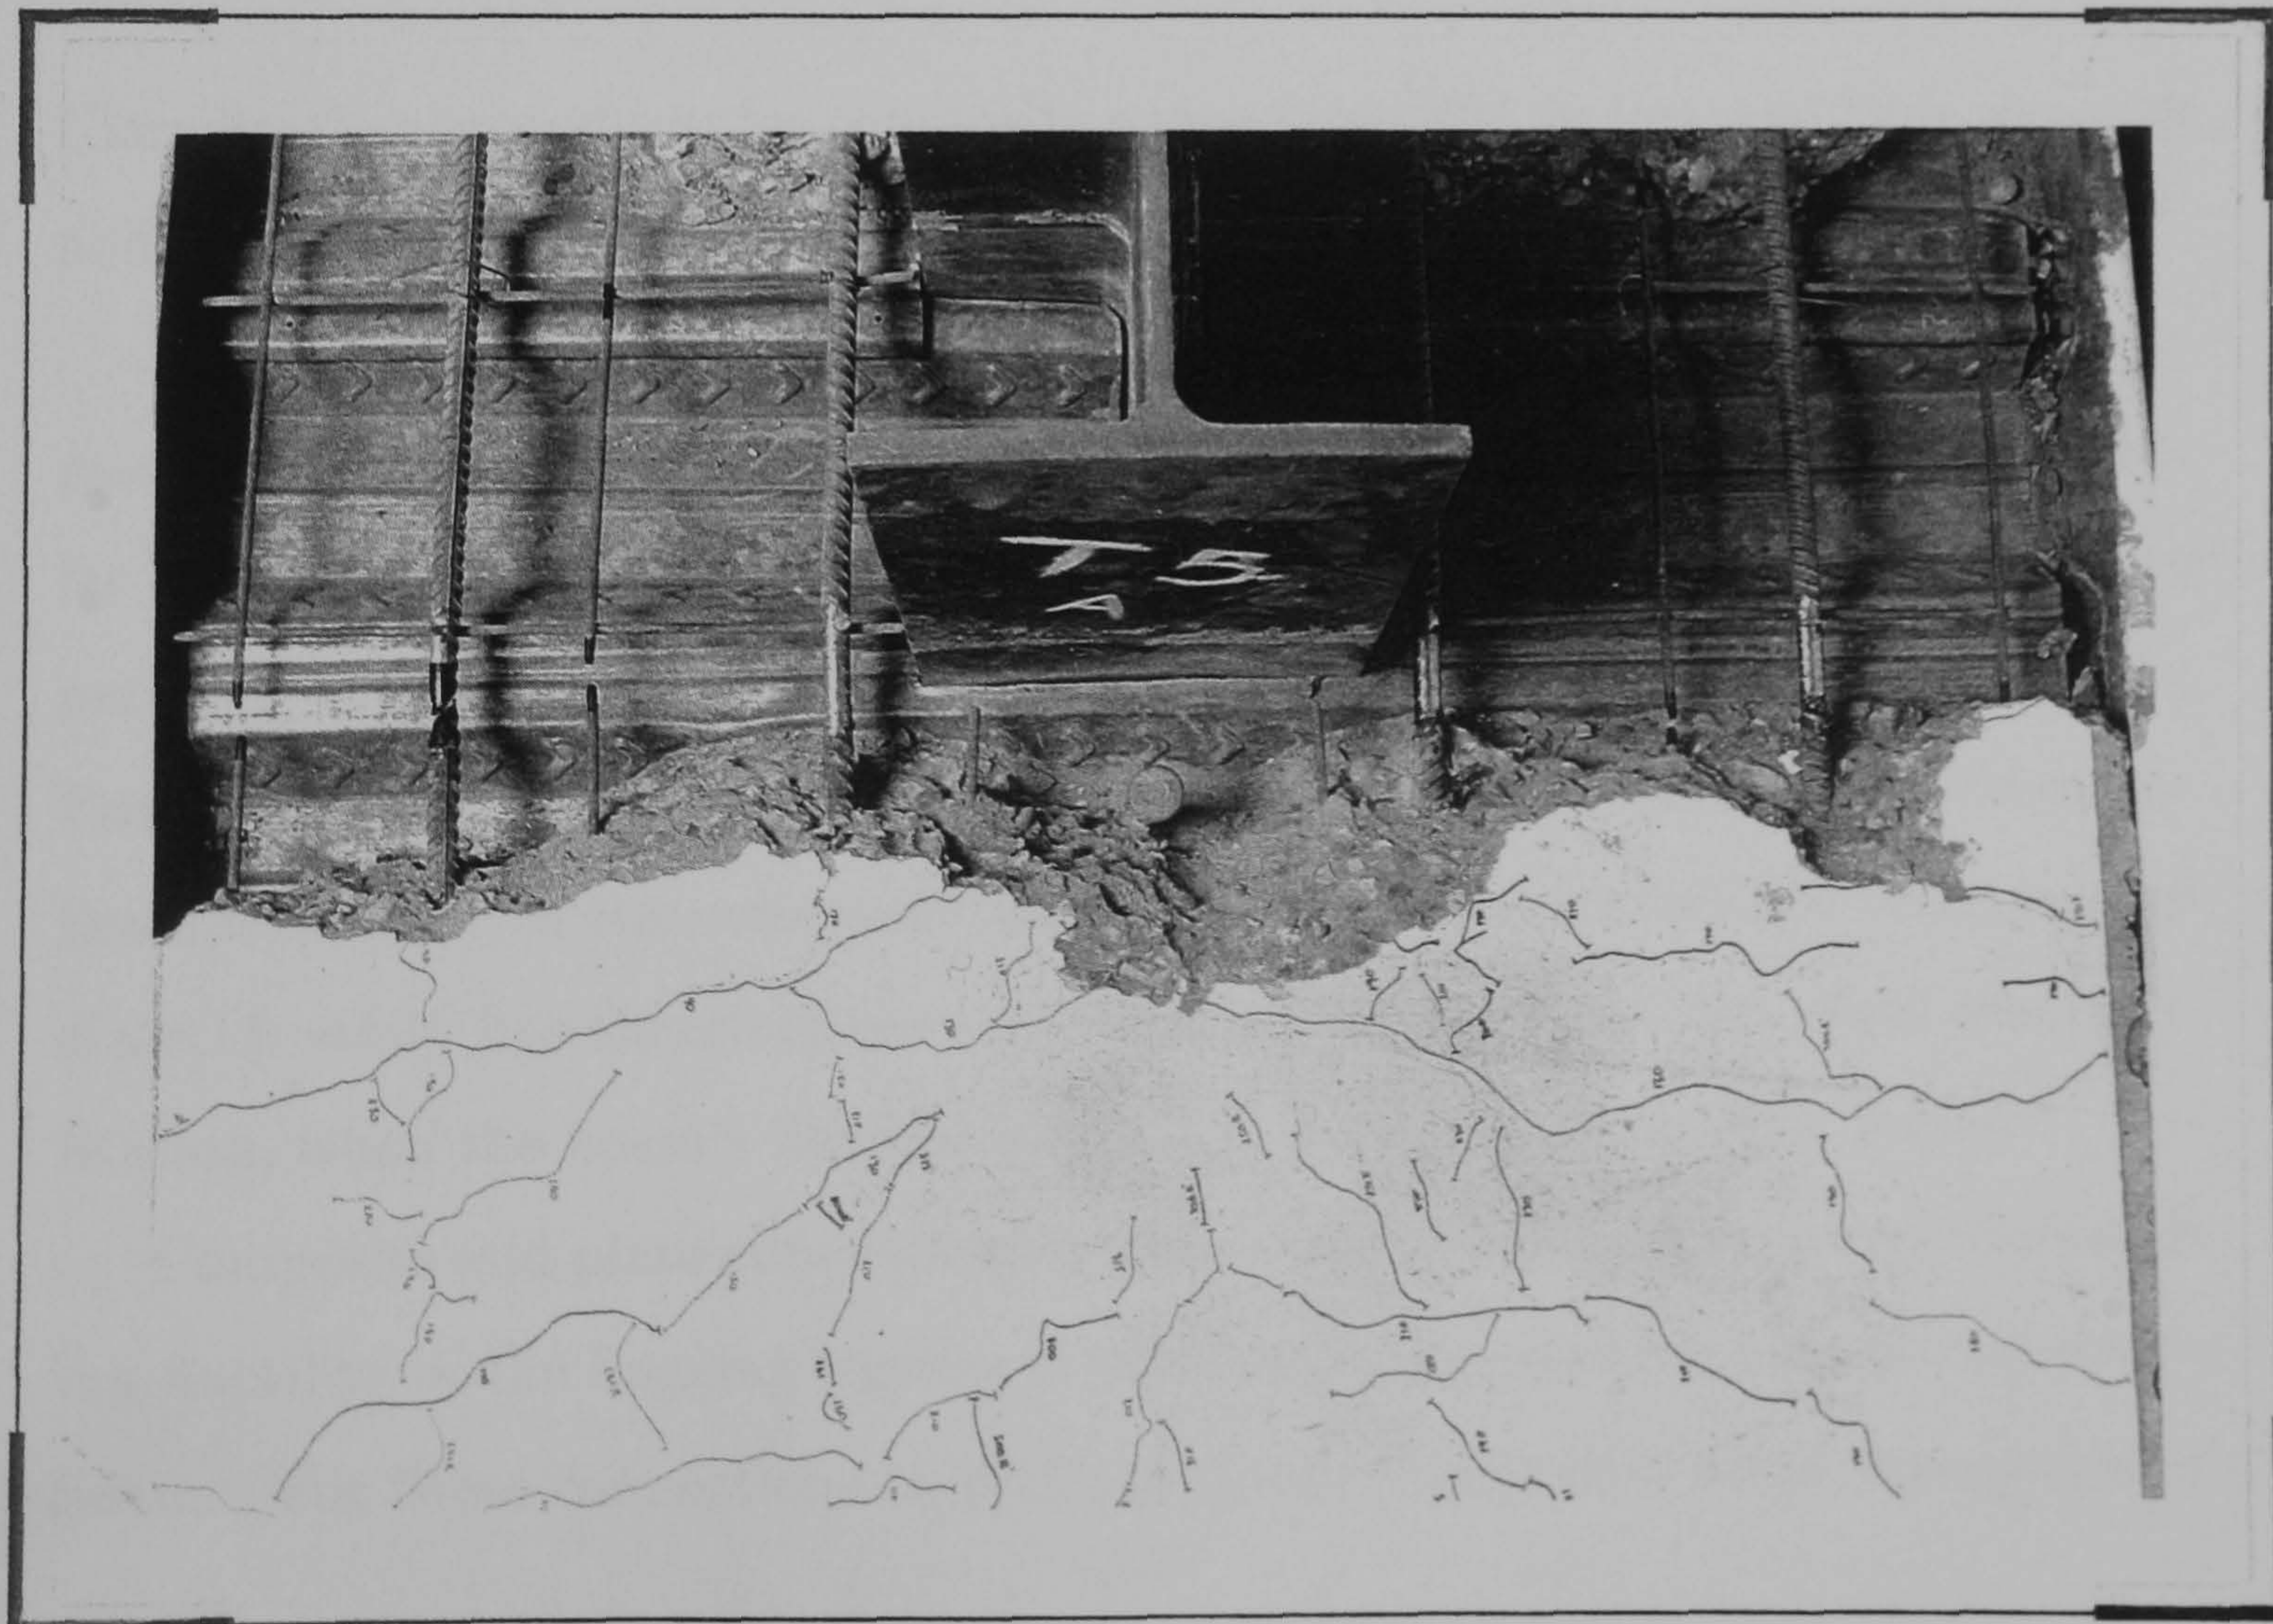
Test 5: exposed reinforcement showing outer rebar fracture (front)
